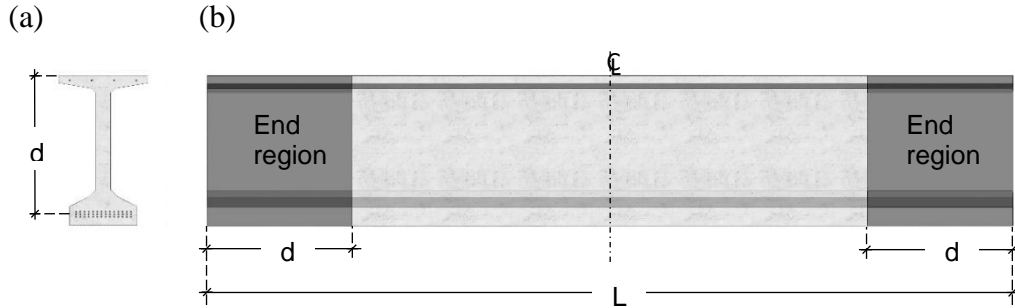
(a) Bulb tee cross section (b) side view of the girder with highlighted end regions
